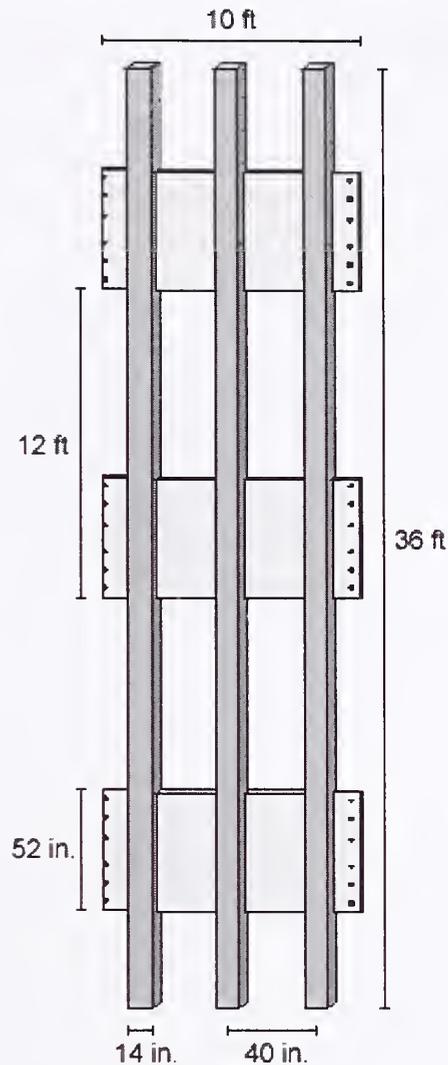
A representation of a typical steel panel section used in the construction of the WTC towers is shown. Dimensions are included.
